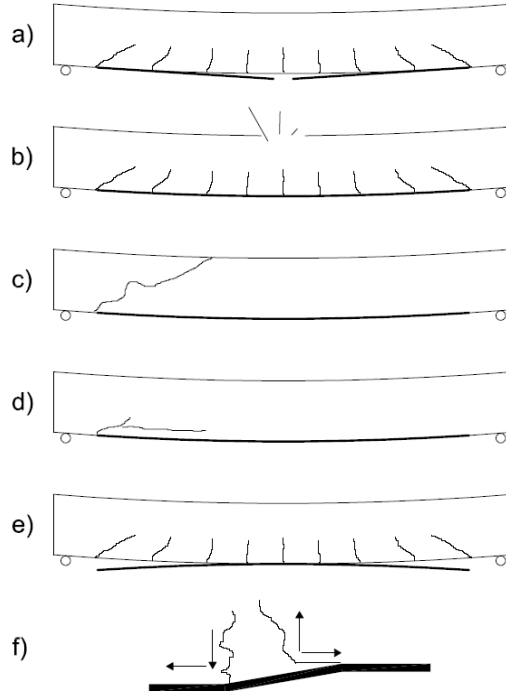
Failure Modes in FRP Retrofitted Concrete Beams
